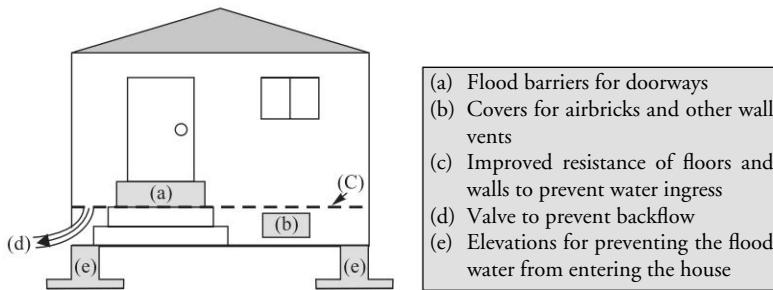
Elevations and barriers for flood-risk minimisation
